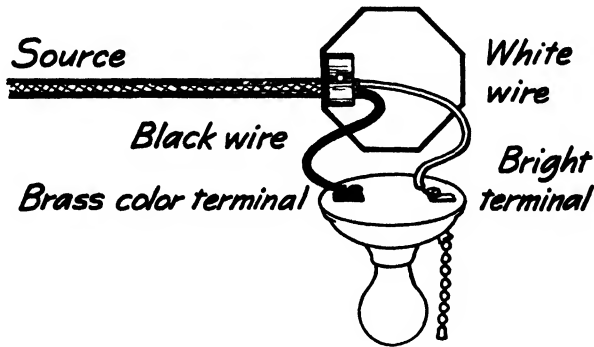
The wiring connections for a pull-chain fixture using armored cable.
